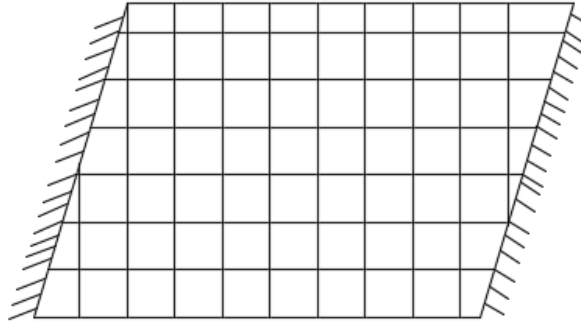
Recommended reinforcement pattern for skewed decks (Anusreebai & Krishnachandran, 2016).
